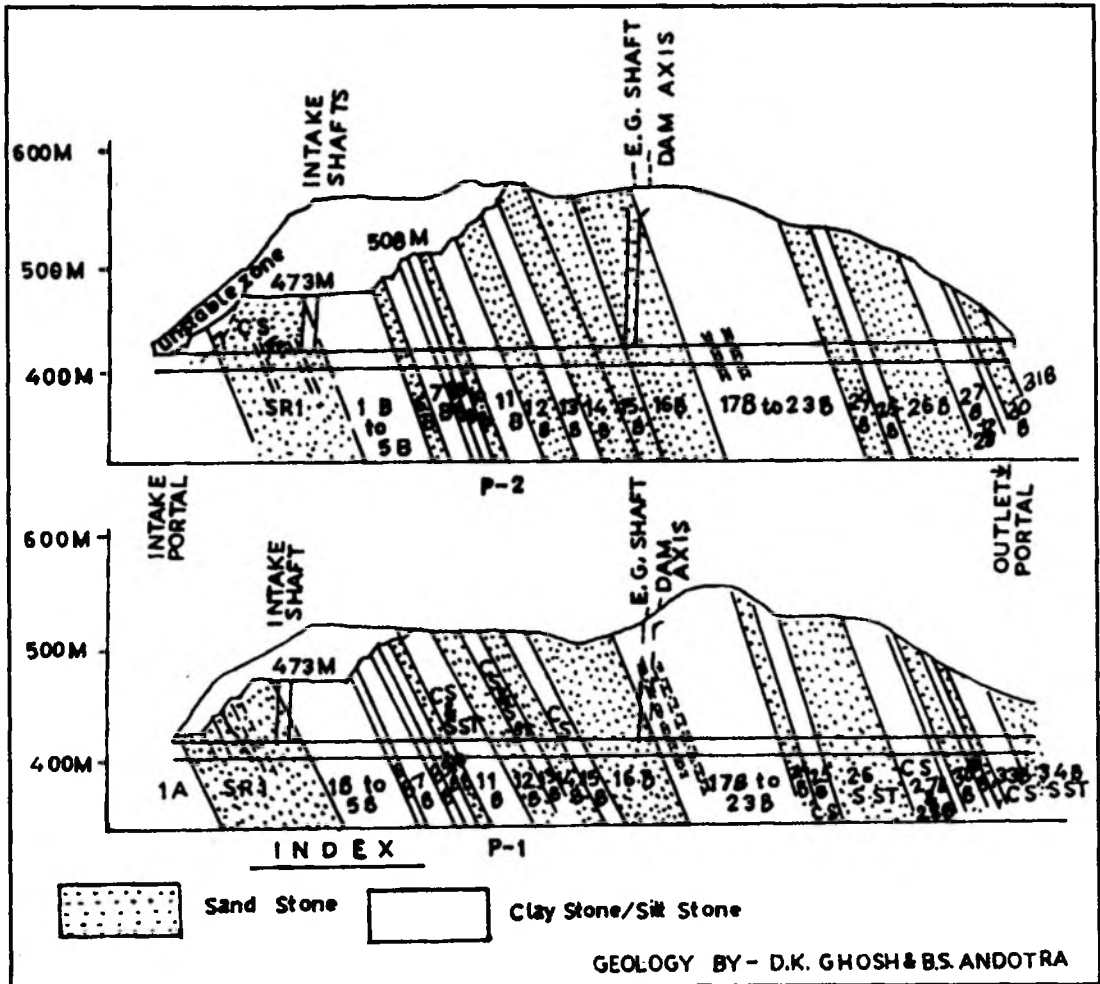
Geological section along Power Tunnels P-1 and P-2.
